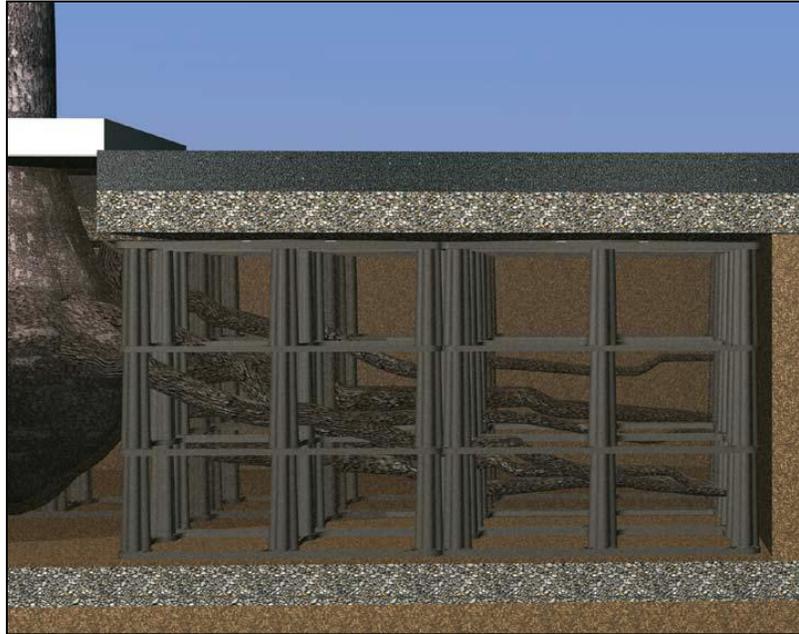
Silva Cell under roadway (soil not shown for clarity)
